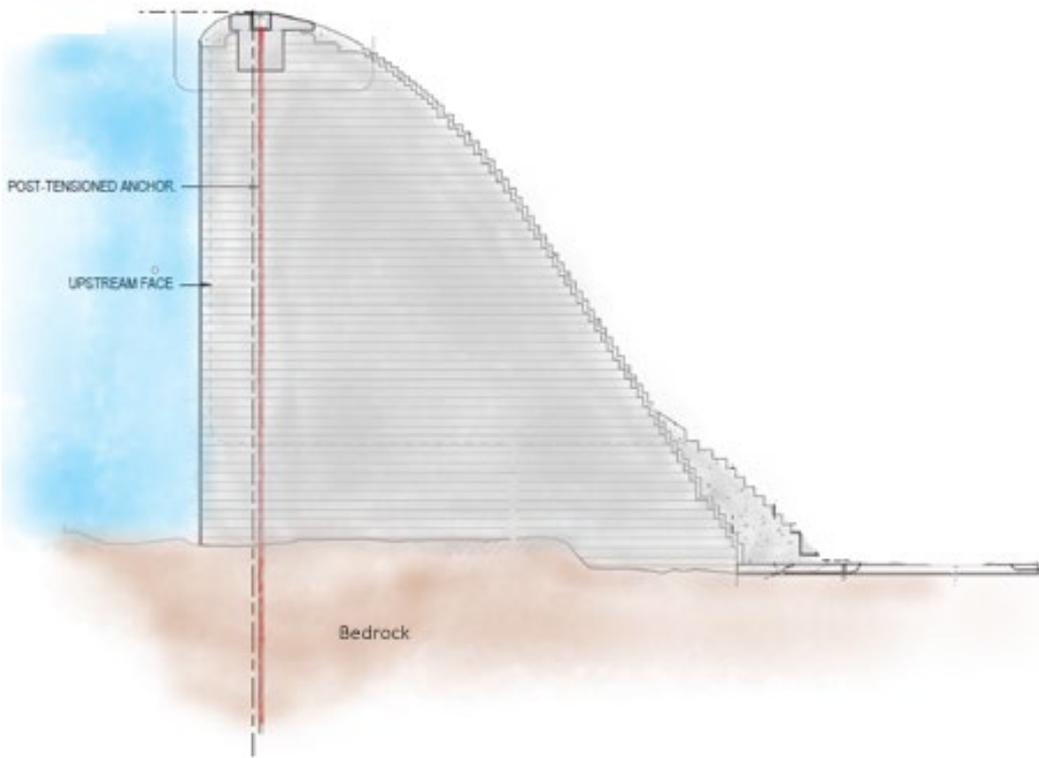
Stylised Paradise Dam Spillway section with post-tensioned anchor
